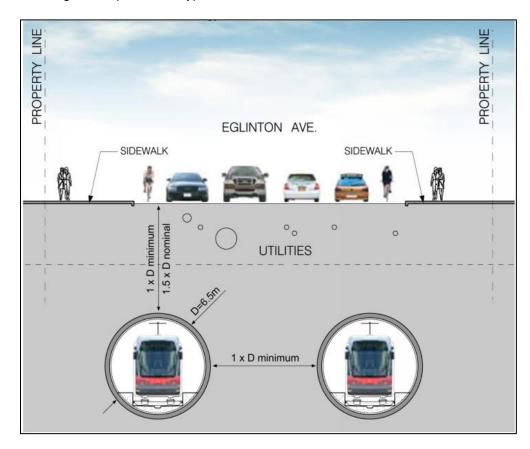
Conceptual Tunnel and Typical Midblock Cross Section between Stations
